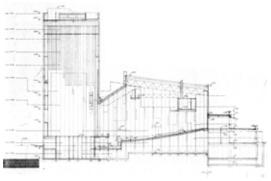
Section Red Hall and Theatre Tower (Antwerp: deSingel).
